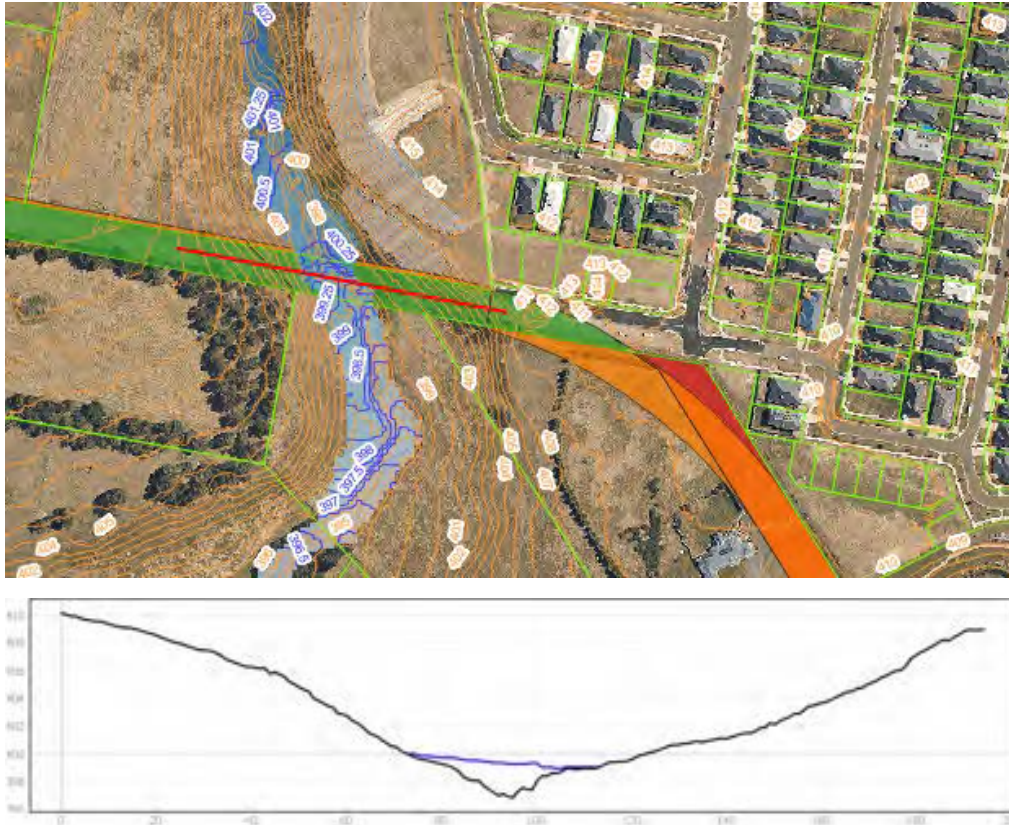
Centreline cross section of proposed road bridge (DI\_RD\_31c) and 1% AEP flood level (blue)
